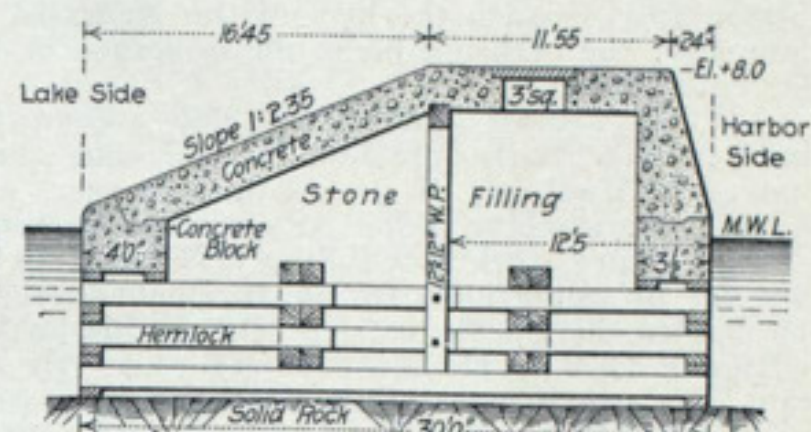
Typical cross-section of concrete shell superstructure for Dunkirk breakwater.
